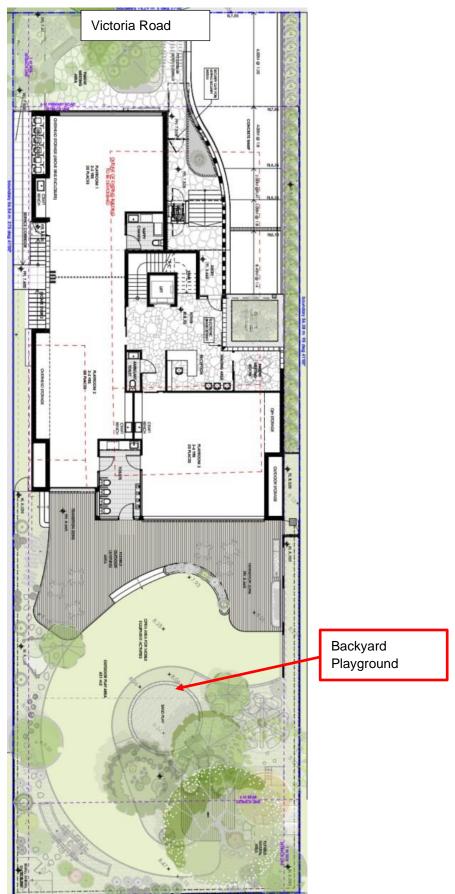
Proposed Child Care Centre Layout – Ground Level
